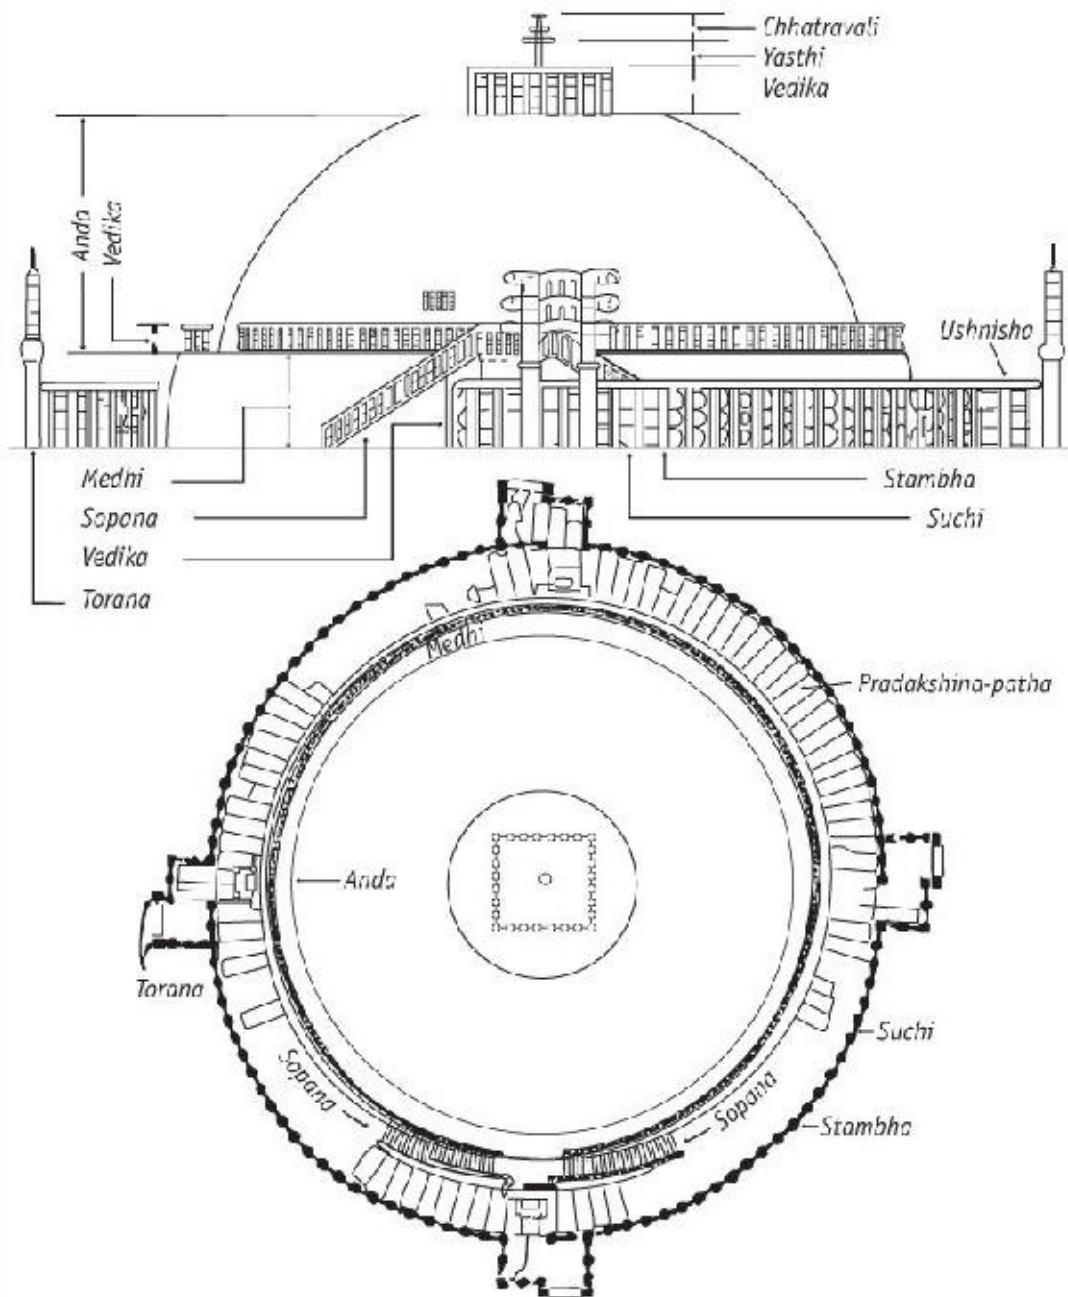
PLAN OF SANCHI STUPA NO. 1 (AFTER MITRA, 1971)
